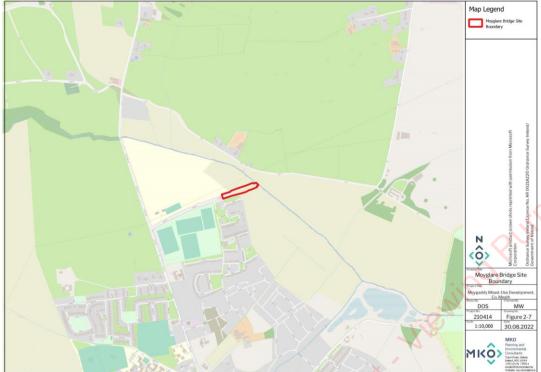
Site Location Plan - Moyglare Bridge Application. Source: MKO
